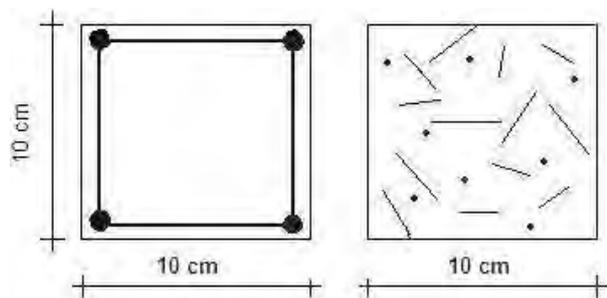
Cross-section of concrete beams with aligned and short reinforcement distributed in volume unit
